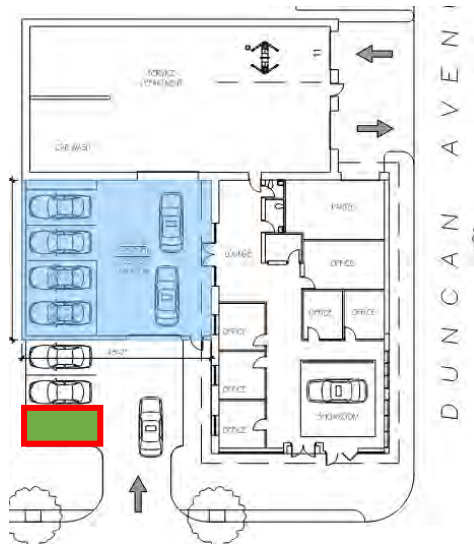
One parking space at 1801 Mount Vernon Avenue, outlined in red, is recommended for removal and for replacement with open space. The area recommended for open space and landscaping is indicated in green.
